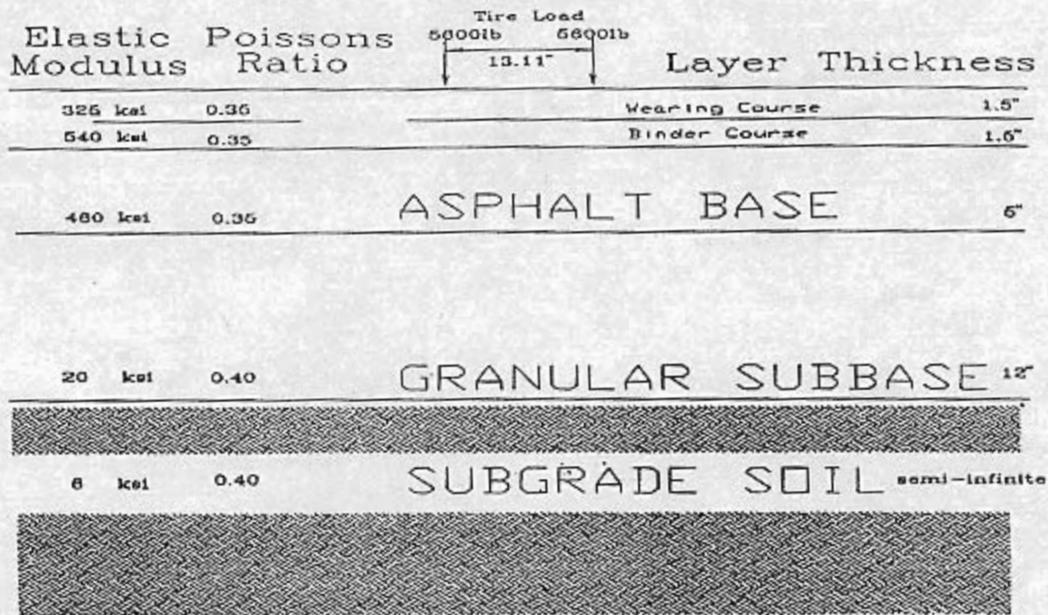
Typical Cross Section of Pavement Structure for the State of Rhode Island
